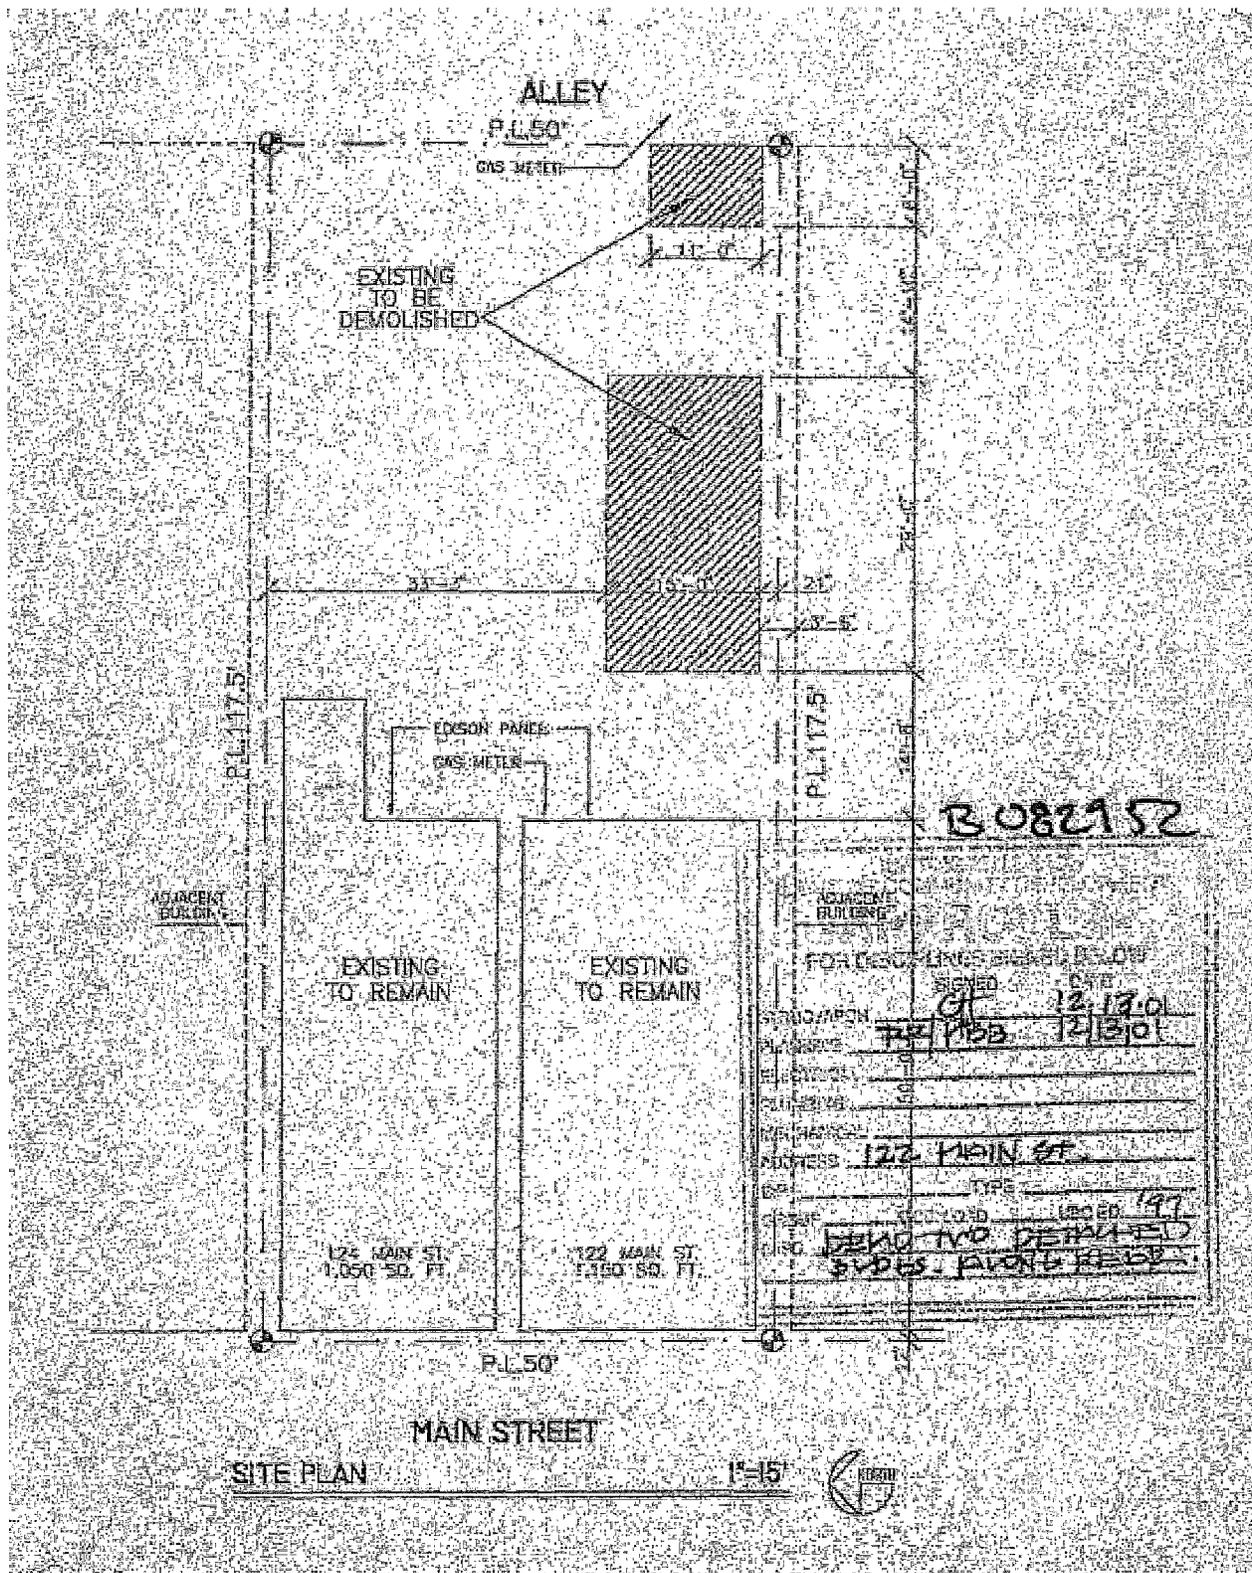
Building permit #B082952 to demolish the rear buildings of 122 Main Street, December 31, 2001.
